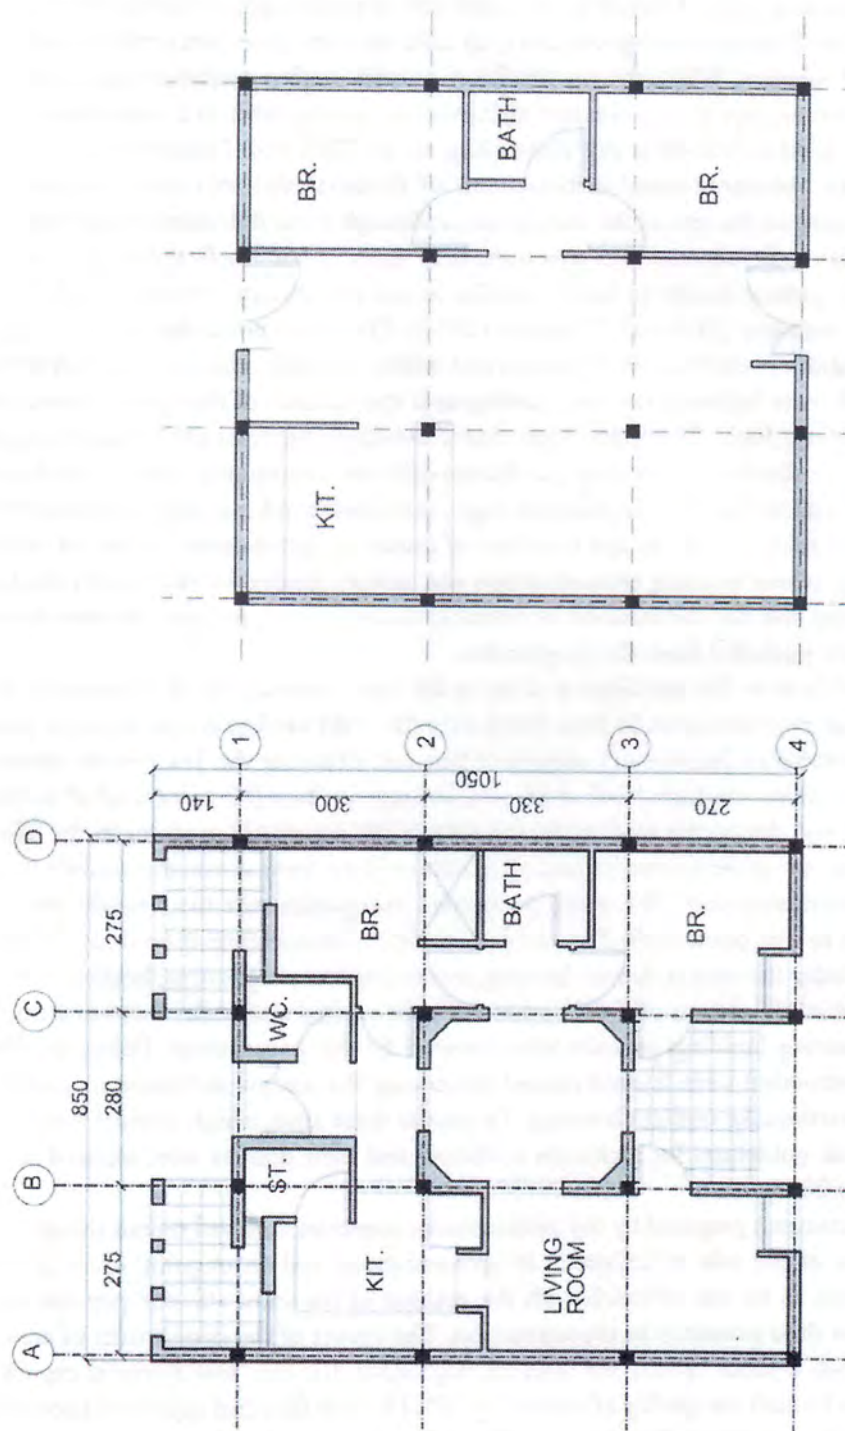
During the reconstruction people did not construct the unnecessary and costly elements in plans. The left-hand plan is designed by an architect in Bam and the right-hand plan is the implemented one.
